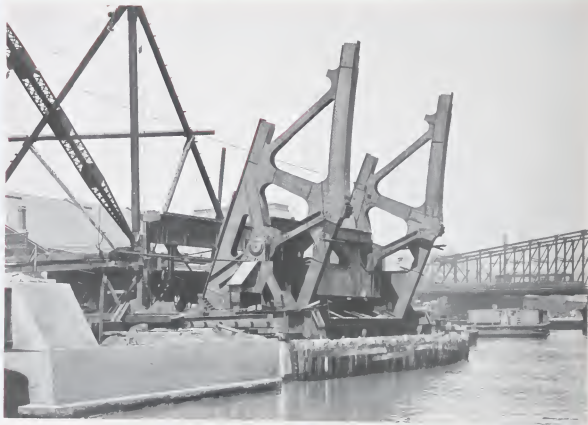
(c) ERECTION VIEW, JACKSON STREET BRIDGE CHICAGO
